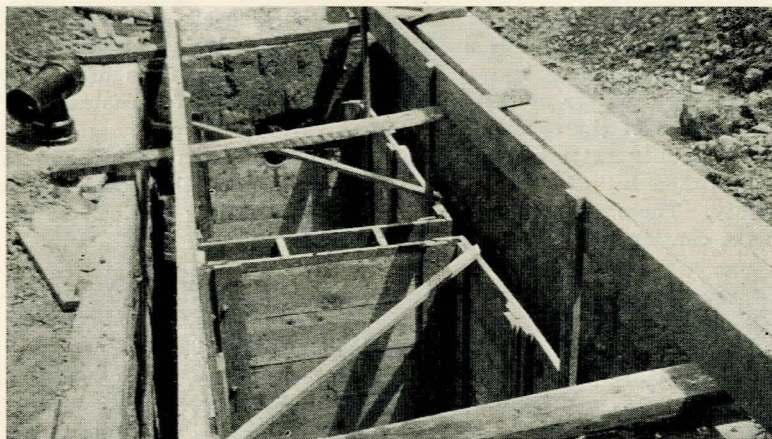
Forms suspended in excavation, showing method of hanging forms.
